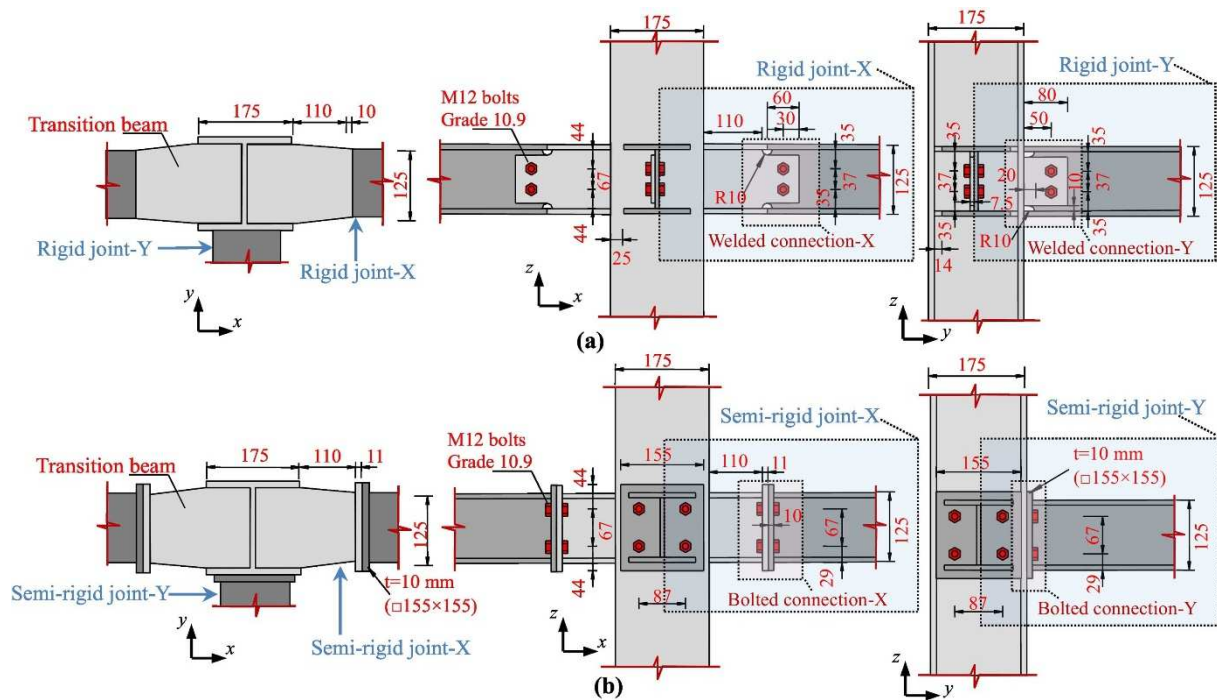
Typical connections used in the beam-to-column joints: (a) rigid joint; (b) semi-rigid joint (in mm).
